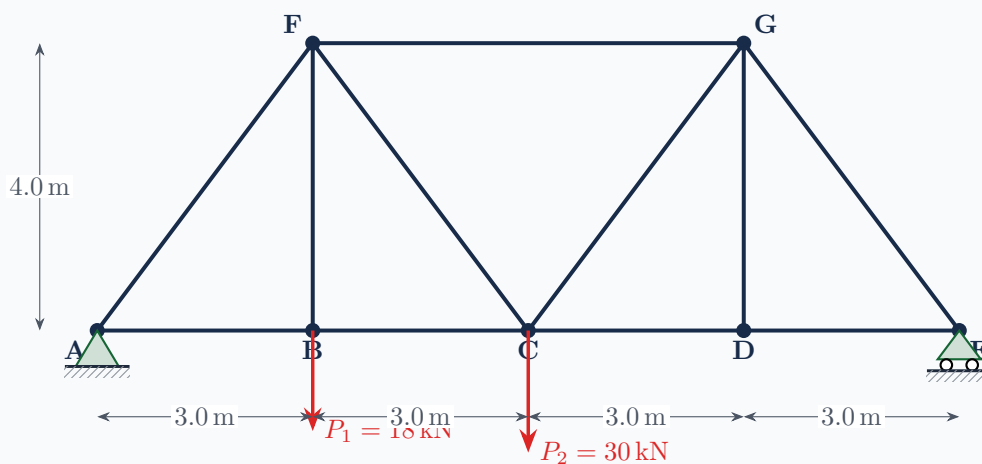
Pin-connected planar bridge truss loading configuration and geometry.
